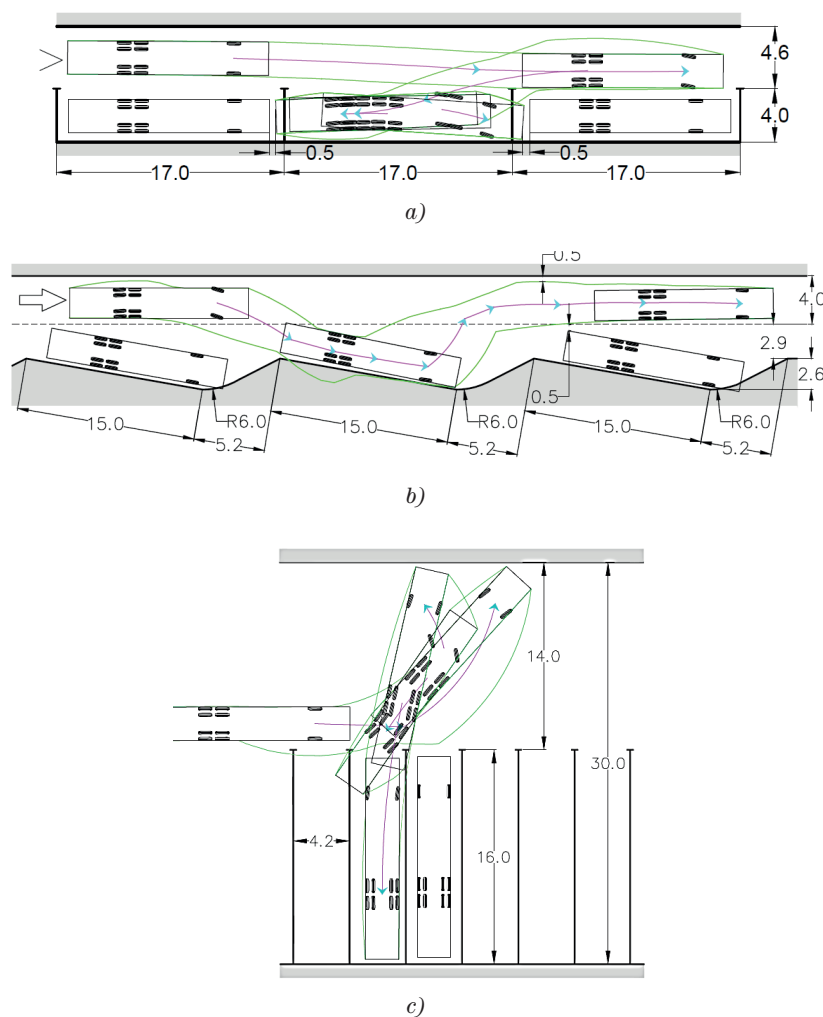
Scheme and dimensions of parking spaces for bus: a) when parallel; b) saw tooth; c) perpendicular placement in relation to the driveway or manoeuvring zone.
